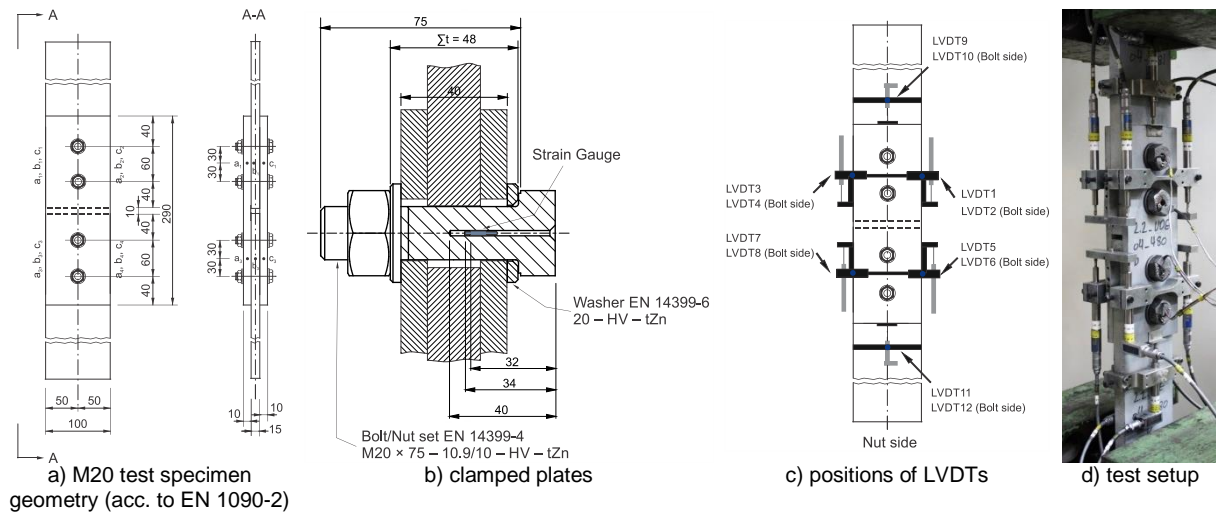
Test setup, test specimen geometry, positions of displacement transducers (LVDTs) as well as clamped plates of a bolted connection with bolts with implanted strain gauge
